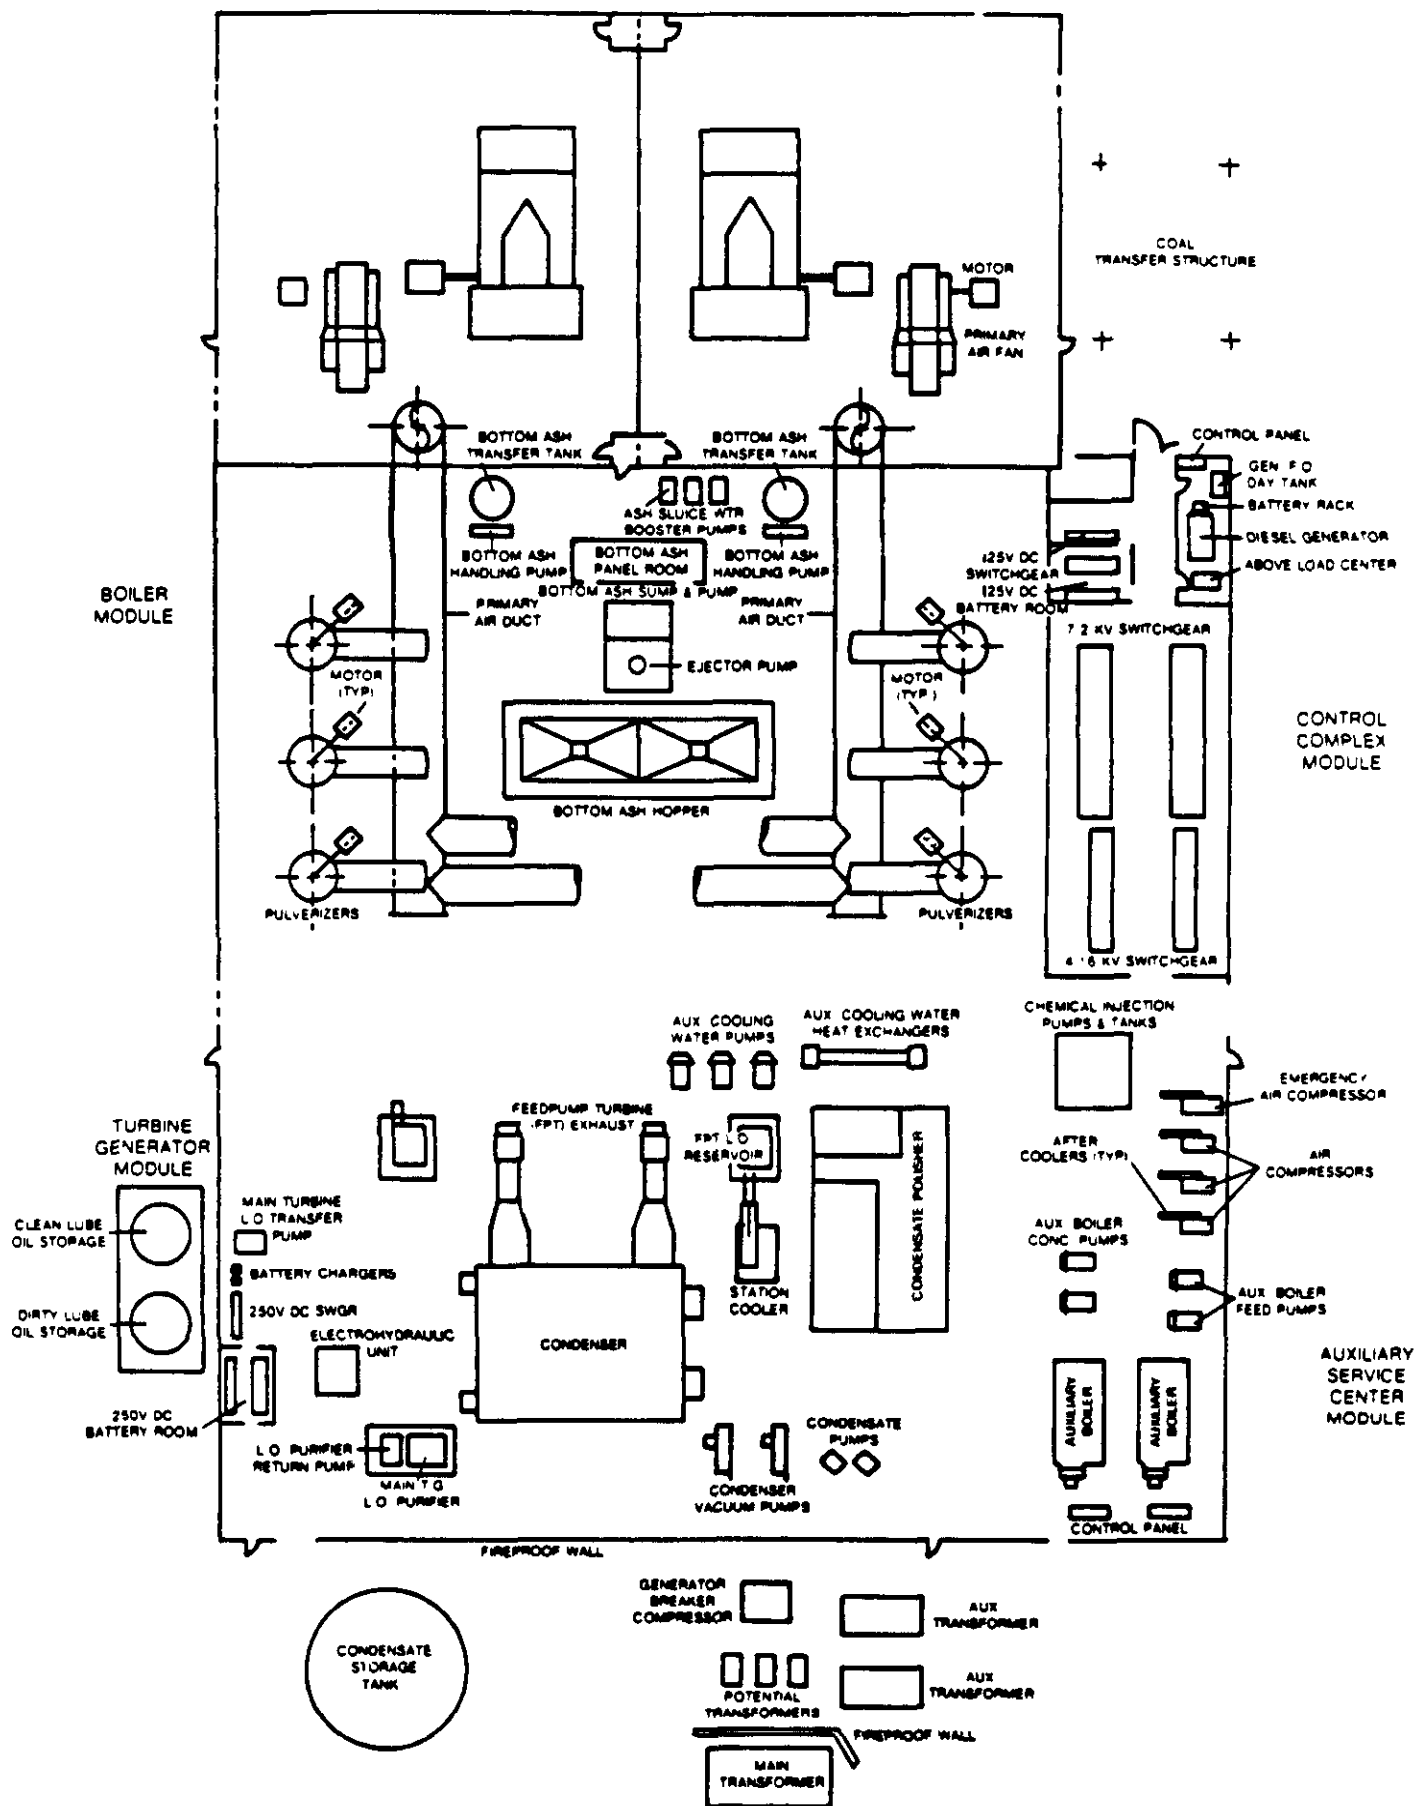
300 MWe Reference Plant Arrangement Plan Ground Floor
